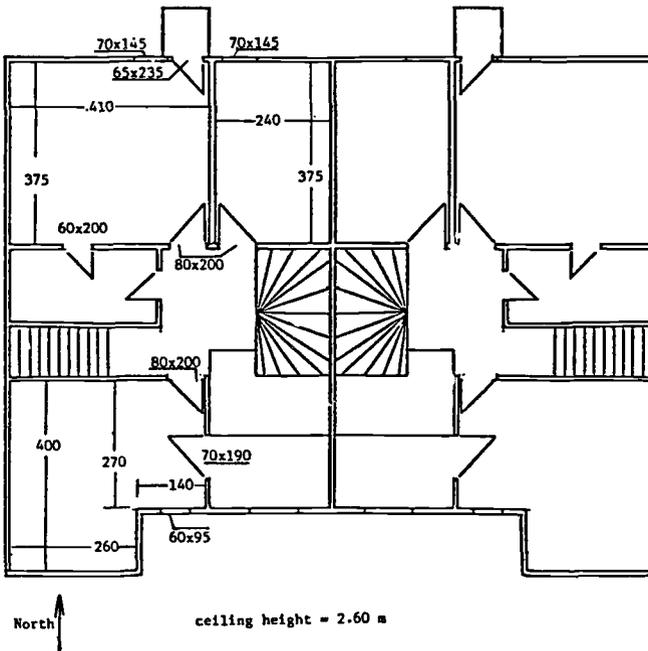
(b,c)—Middle and top floor plans of the three-story dwelling in the second site.
